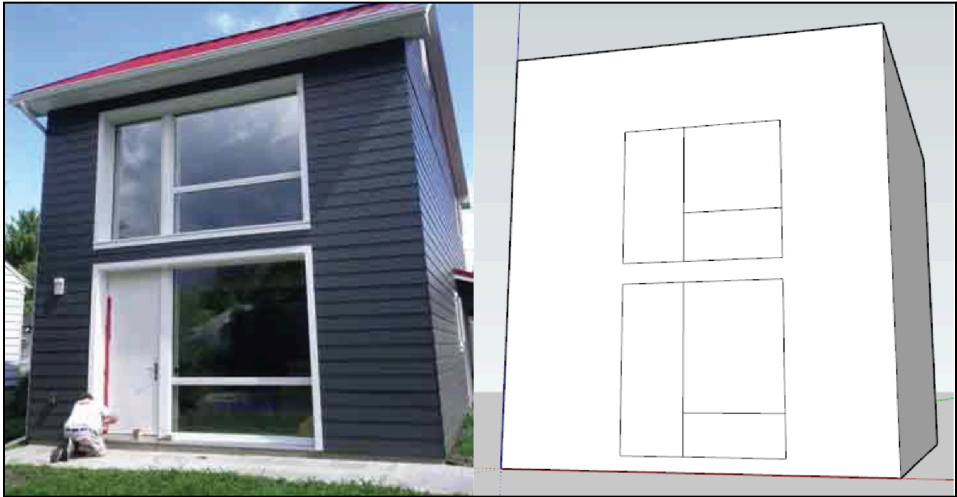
Model each lite of glass and door as a separate surface, to match the actual building configuration.
